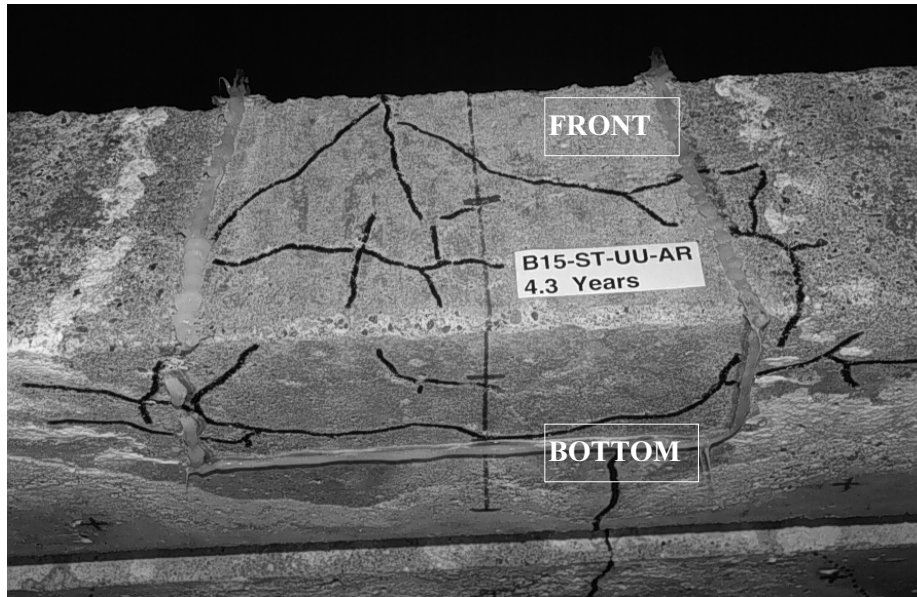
Surface cracking on previously uncracked beam B15 (front and bottom surfaces as in exposure).
